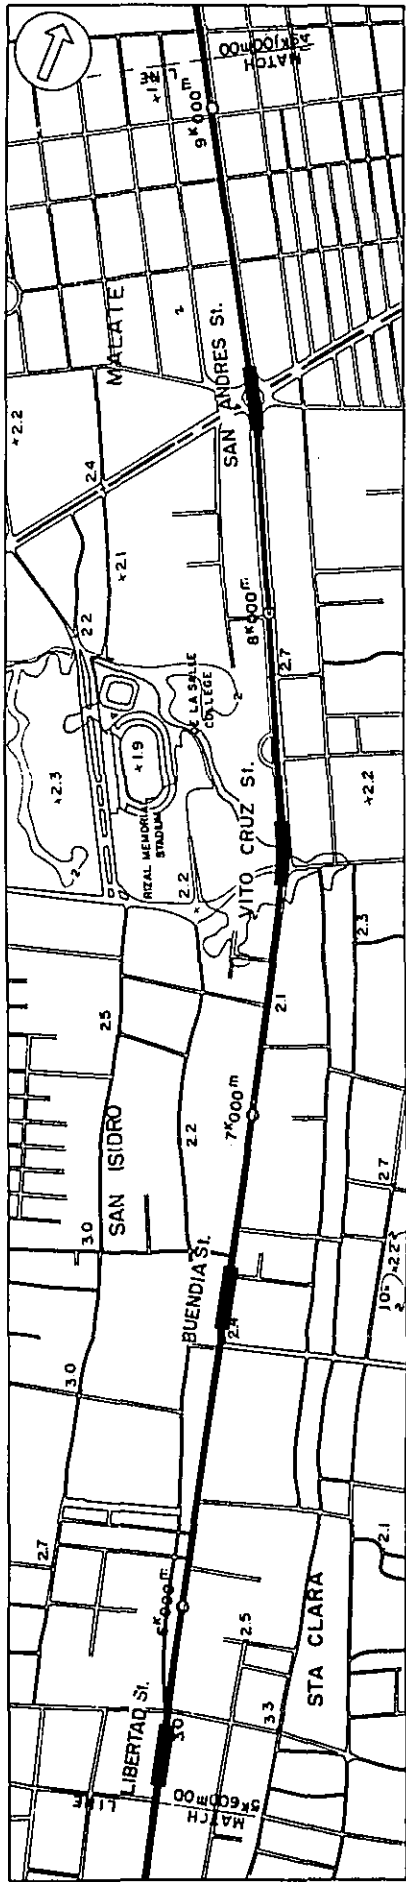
Plan and Profile for Elevation of Taft Avenue (2)
